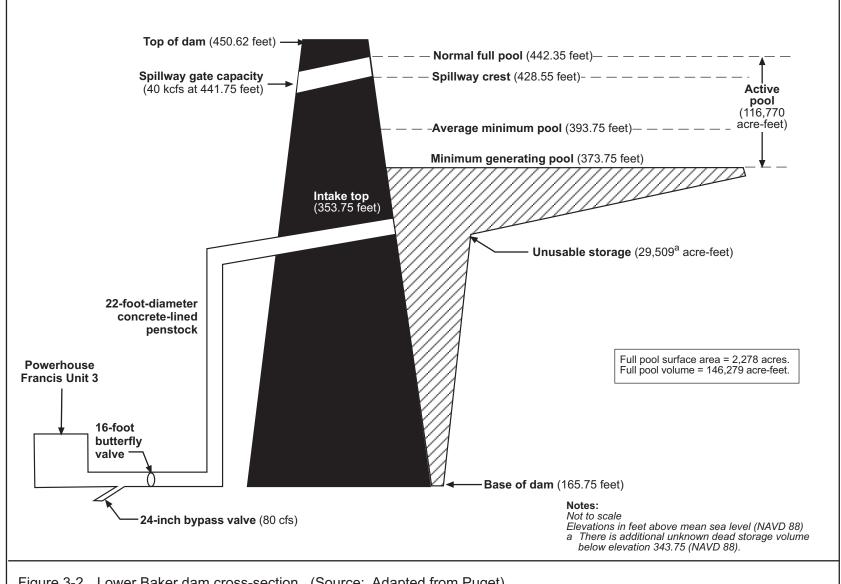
Lower Baker dam cross-section. (Source: Adapted from Puget)
